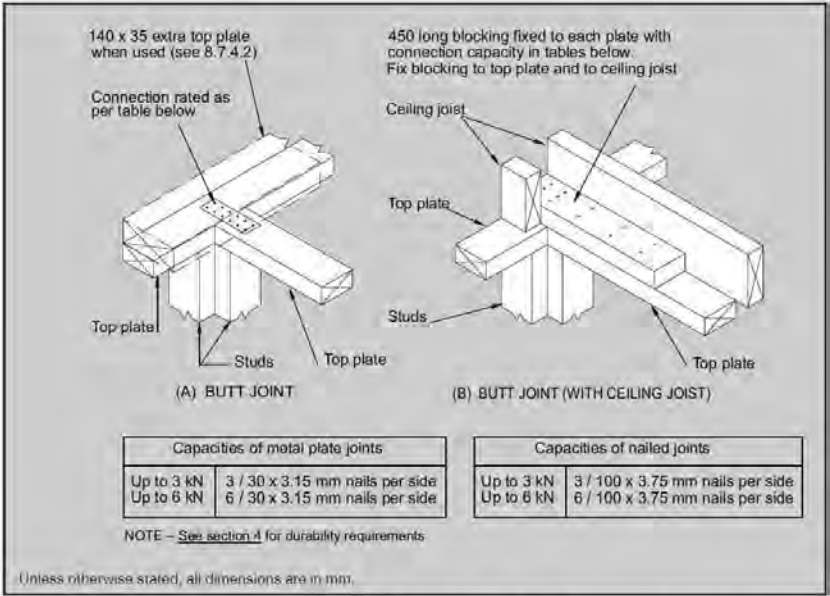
Connecting top plates to external walls at right angles – Walls containing bracing (see 8.7.3.4)
